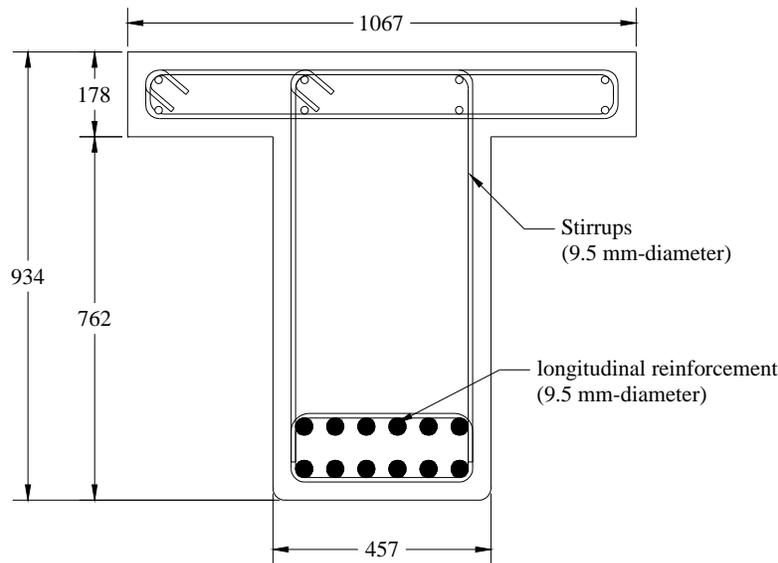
Cross section of the test beams used in this study (dimensions in mm).
